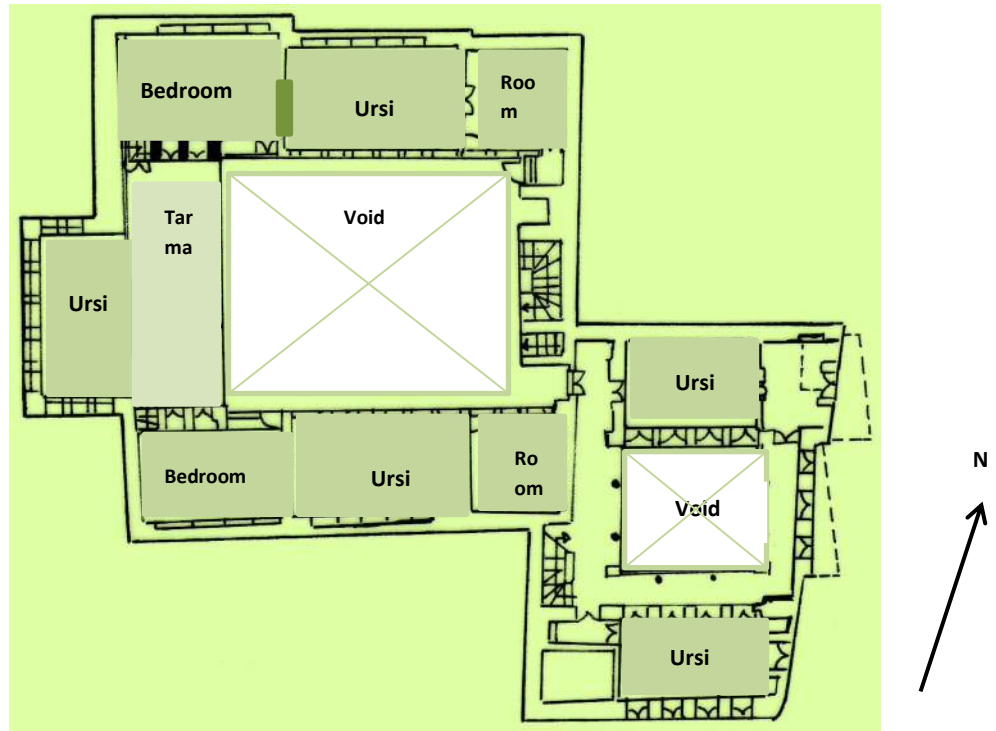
First floor level plan of traditional courtyard house No. 4. Scale: 1:50
